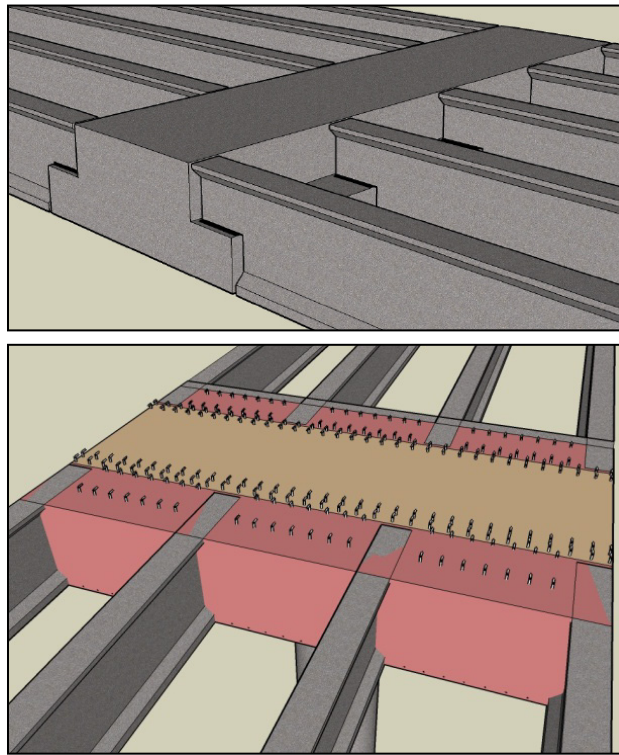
Dapped End Girder with Inverted-Tee Cap (Snyder, 2010)
